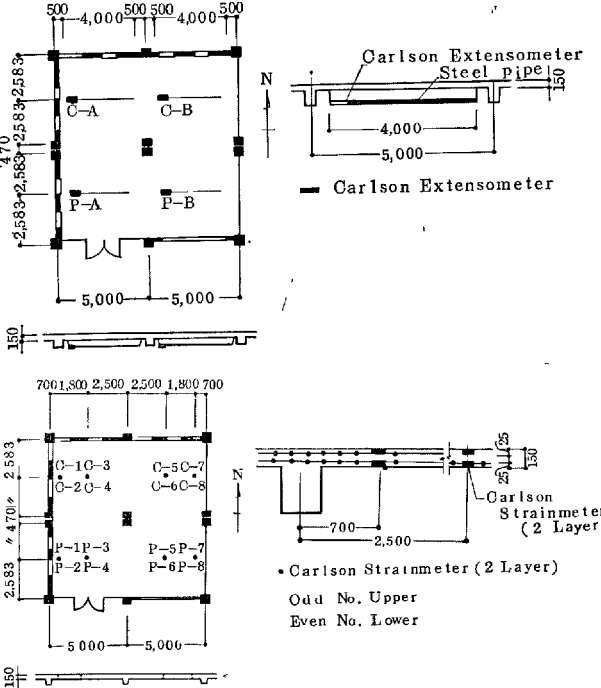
The location of measurement of roof slabs (Unit: mm)
